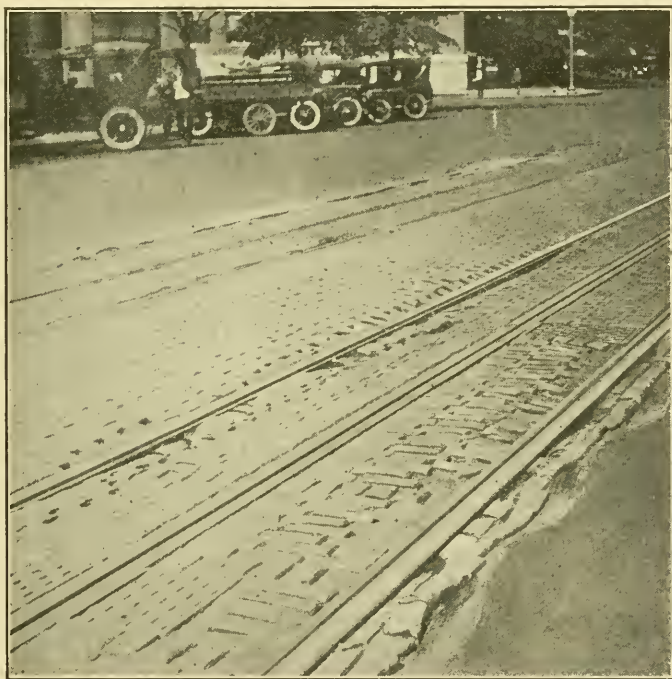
Pavement failure occurs, irrespective of the type of pavement or rail, if the track sub-structure is weak.
